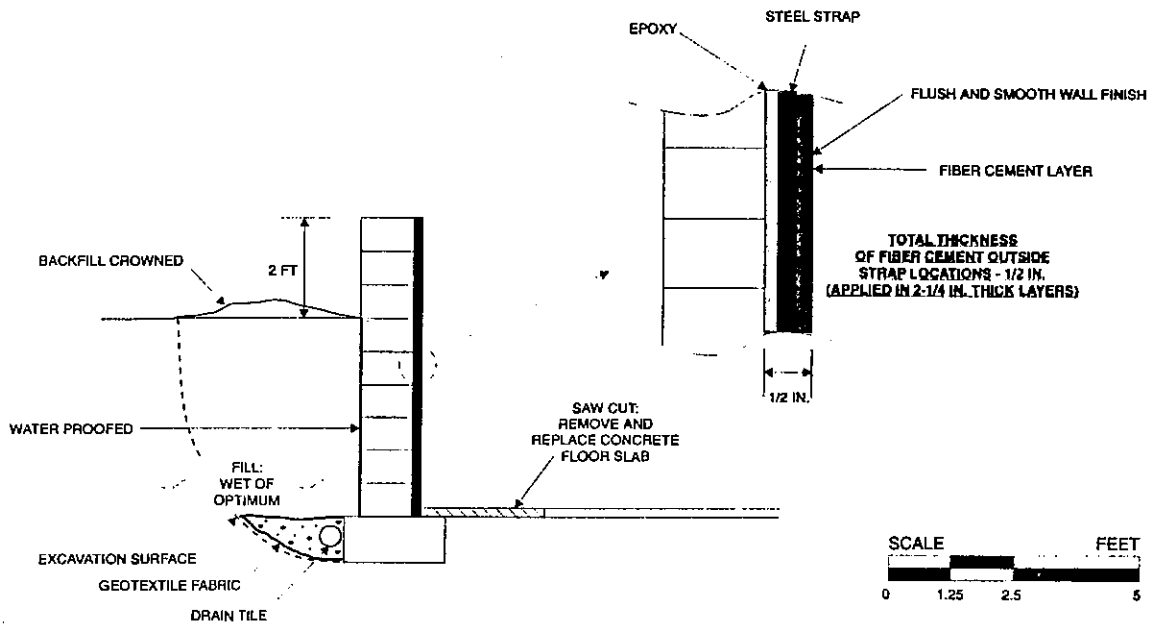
CROSS SECTION OF RETROFIT STRAP/FIBER-CEMENT REINFORCEMENT
